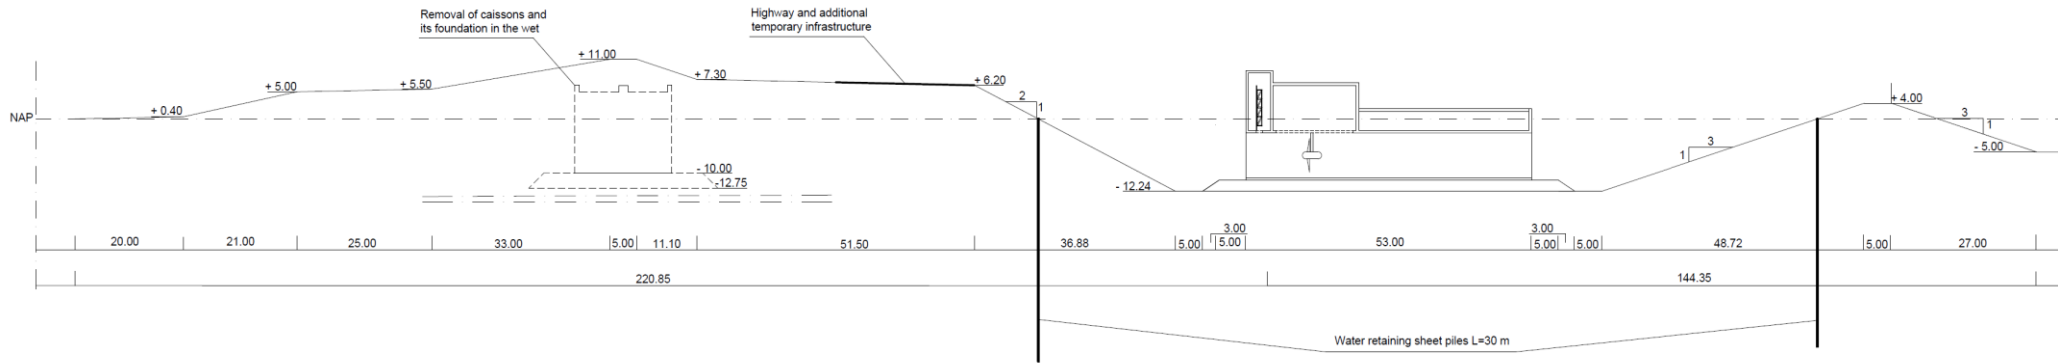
SKETCH CROSS-SECTION CONSTRUCTION METHOD IN THE DRY BEHIND CAISSONS
